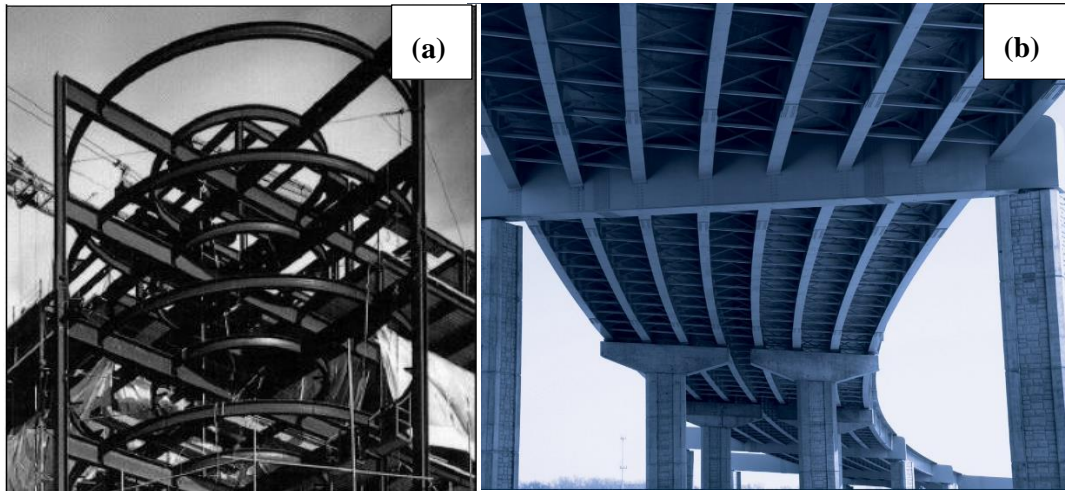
Applications of horizontally curved steel beams, (a) horizontally curved floor beams; and (b) horizontally curved I-beams in a highway bridge
